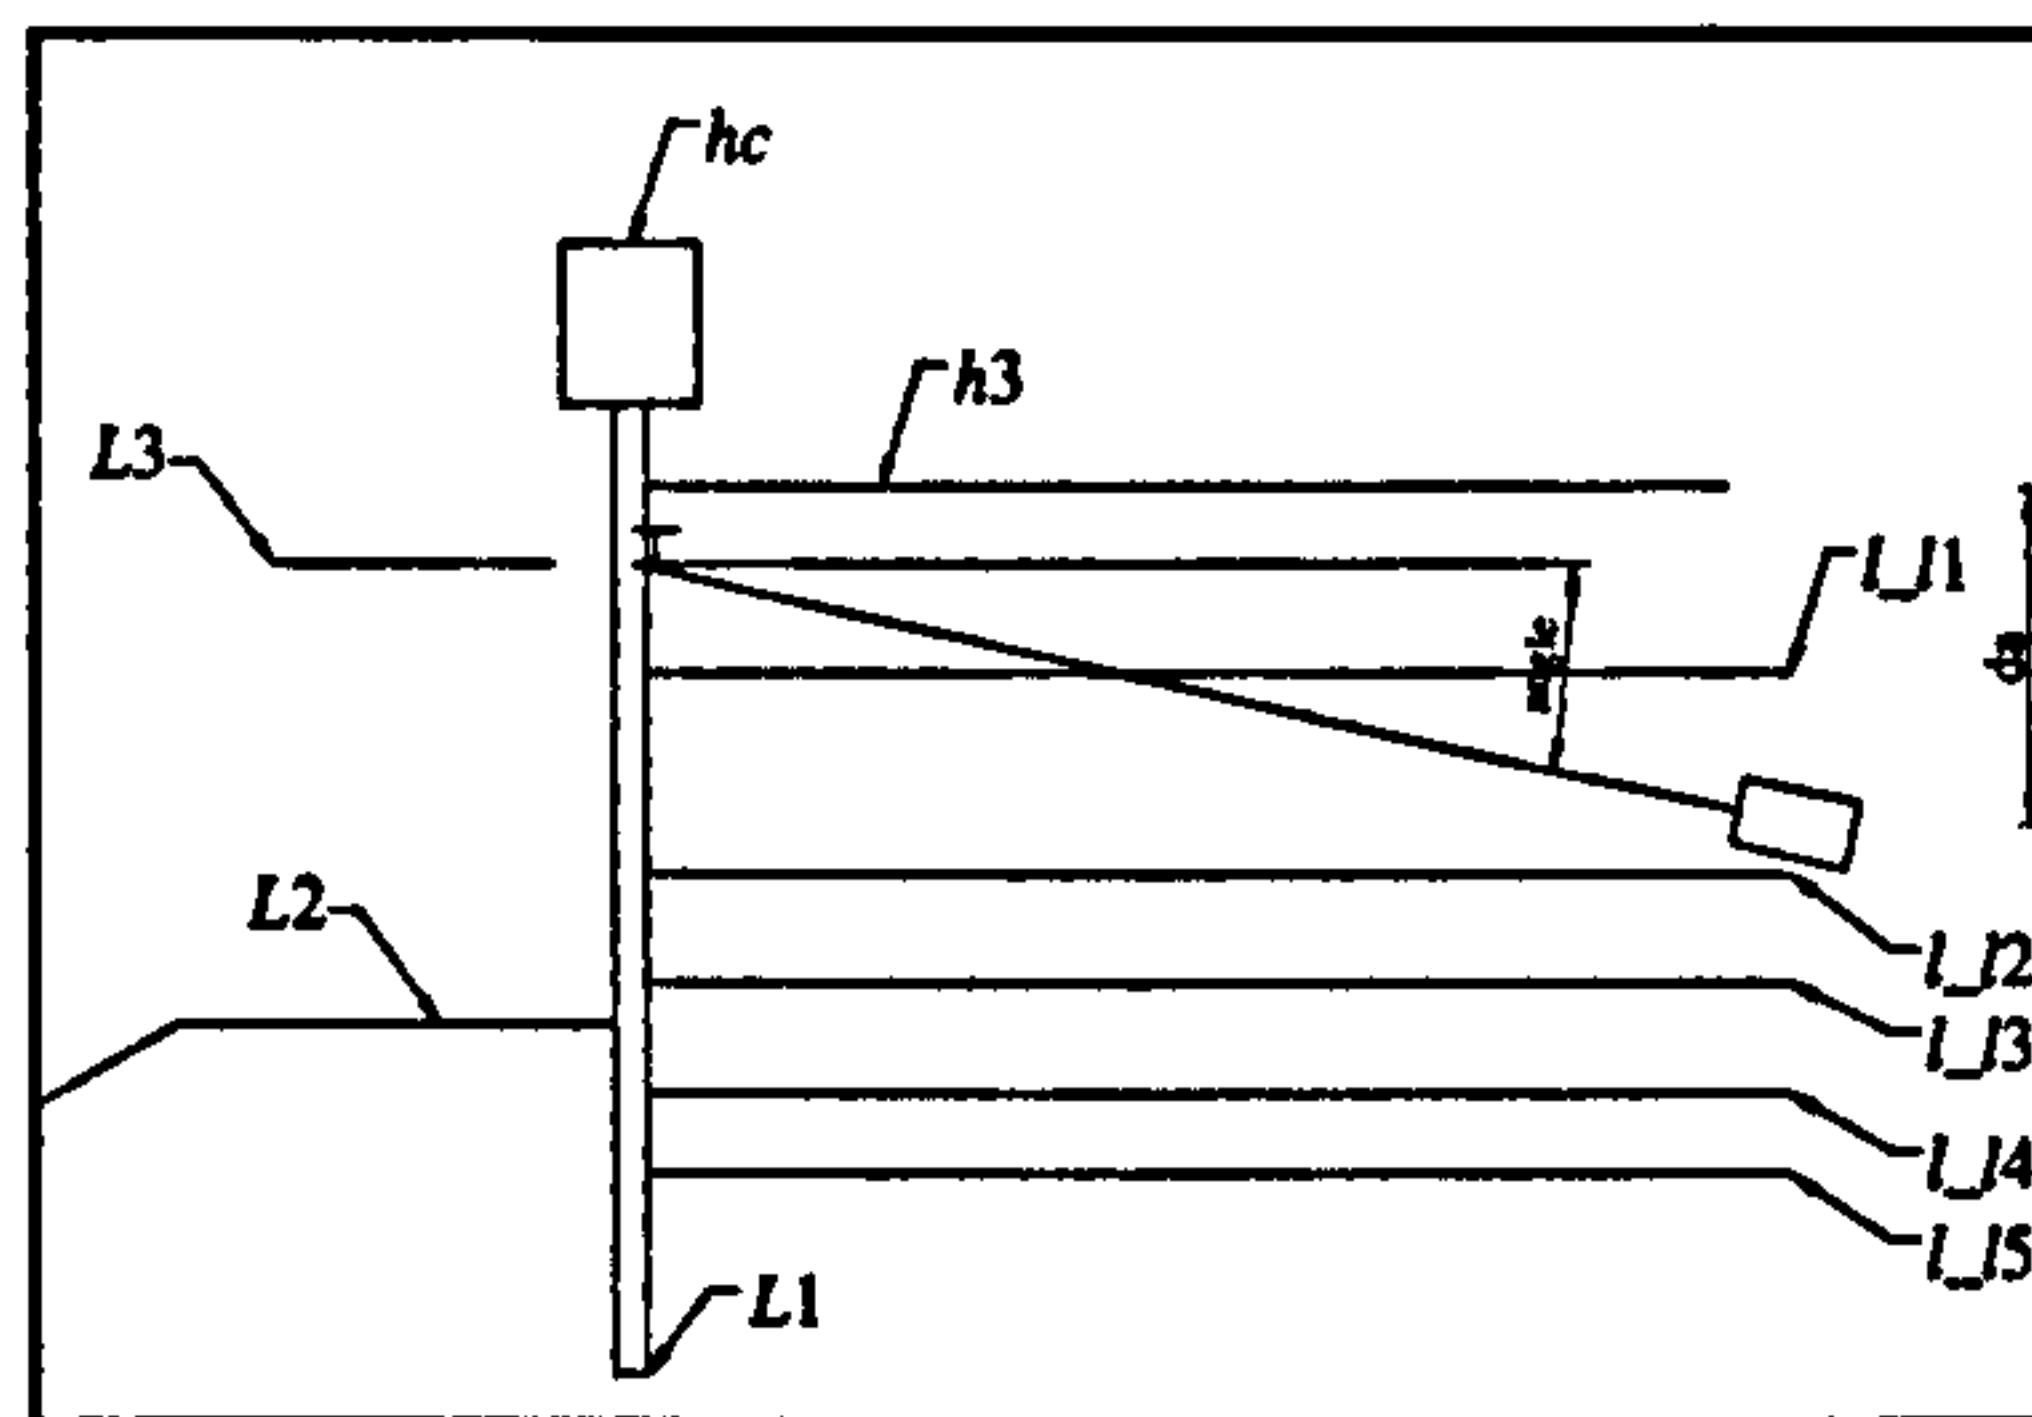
Some dimensions and properties associated with the anchored sheet pile wall.
